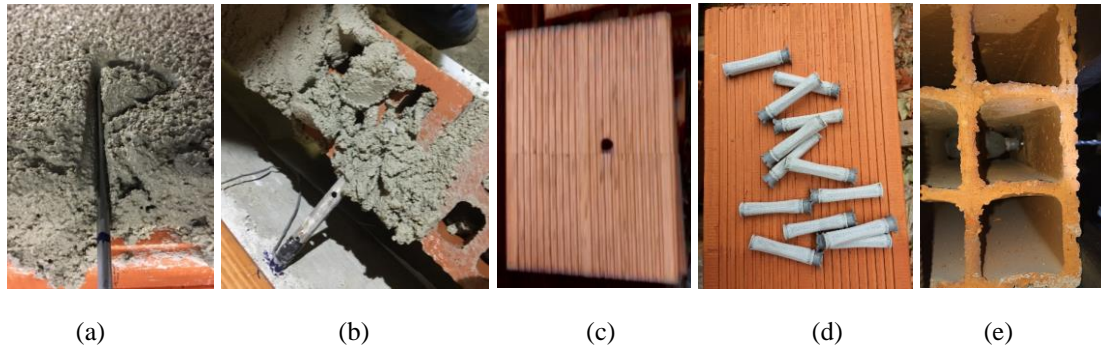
Application of wall ties on mortar bed joint of (a) masonry infill leaf and (b) masonry veneer leaf. Application of T5 wall tie: (c) hole on bricks, (d) sock sleeve to be inserted in hole and filled by grout and (e) chemical anchor resultant inside brick
